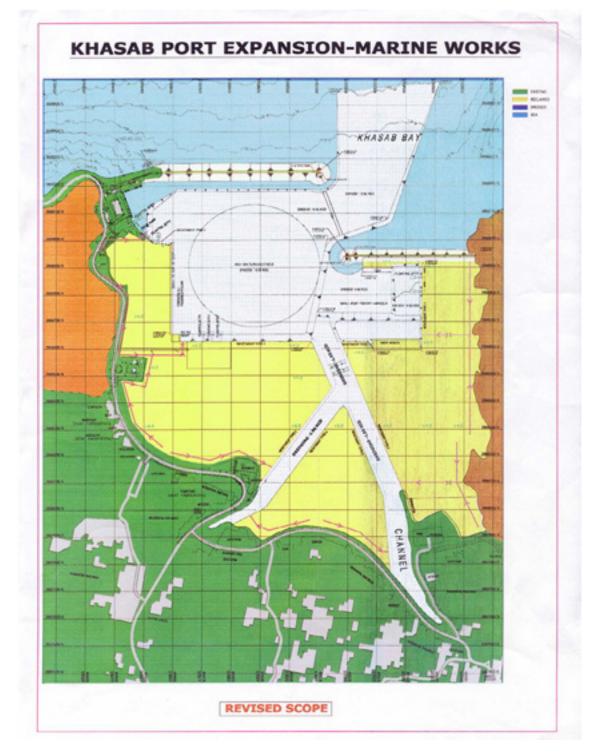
Layout Plan of Khasab Port (Nearly Completed)
